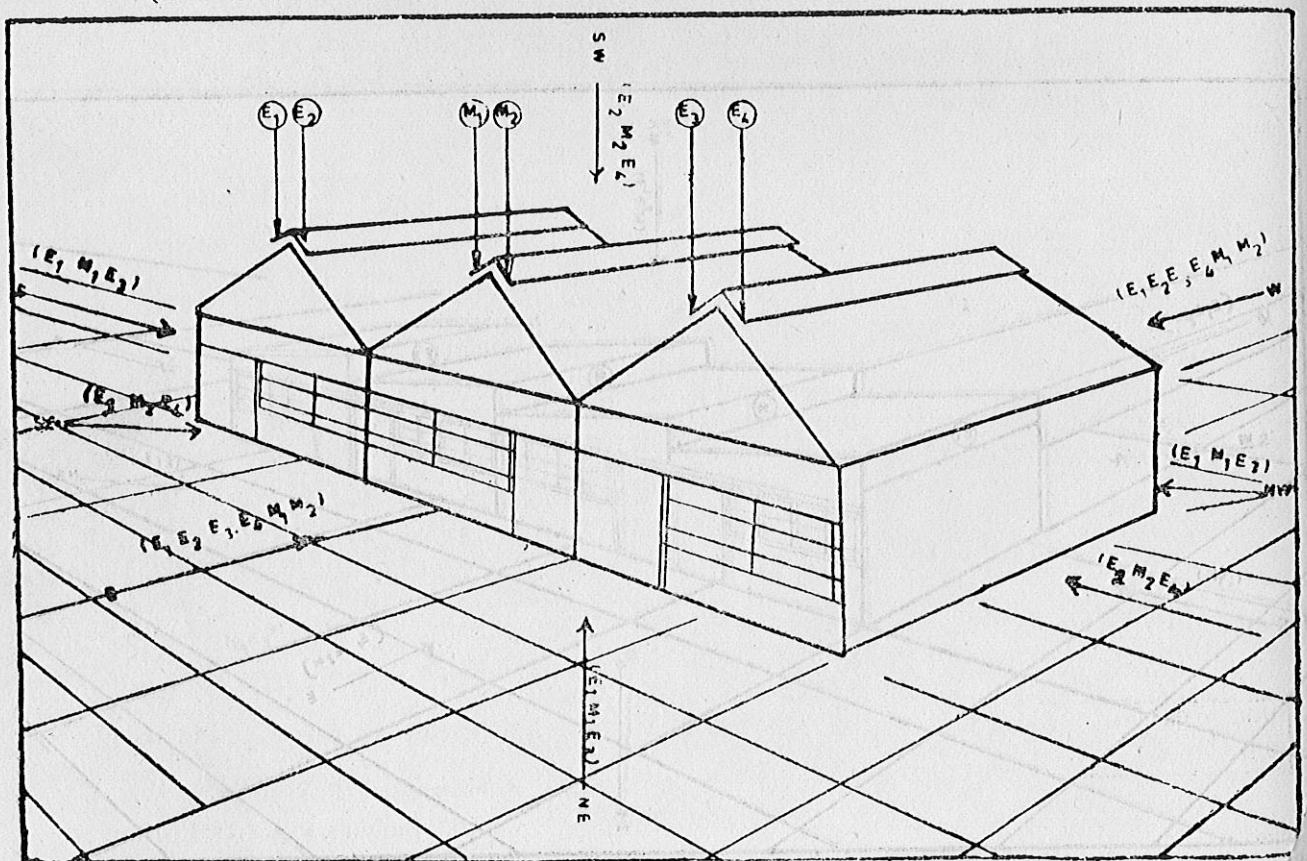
Preferred Location of Roof Openings in Cross Ventilated Pitched Roof Sheds.
